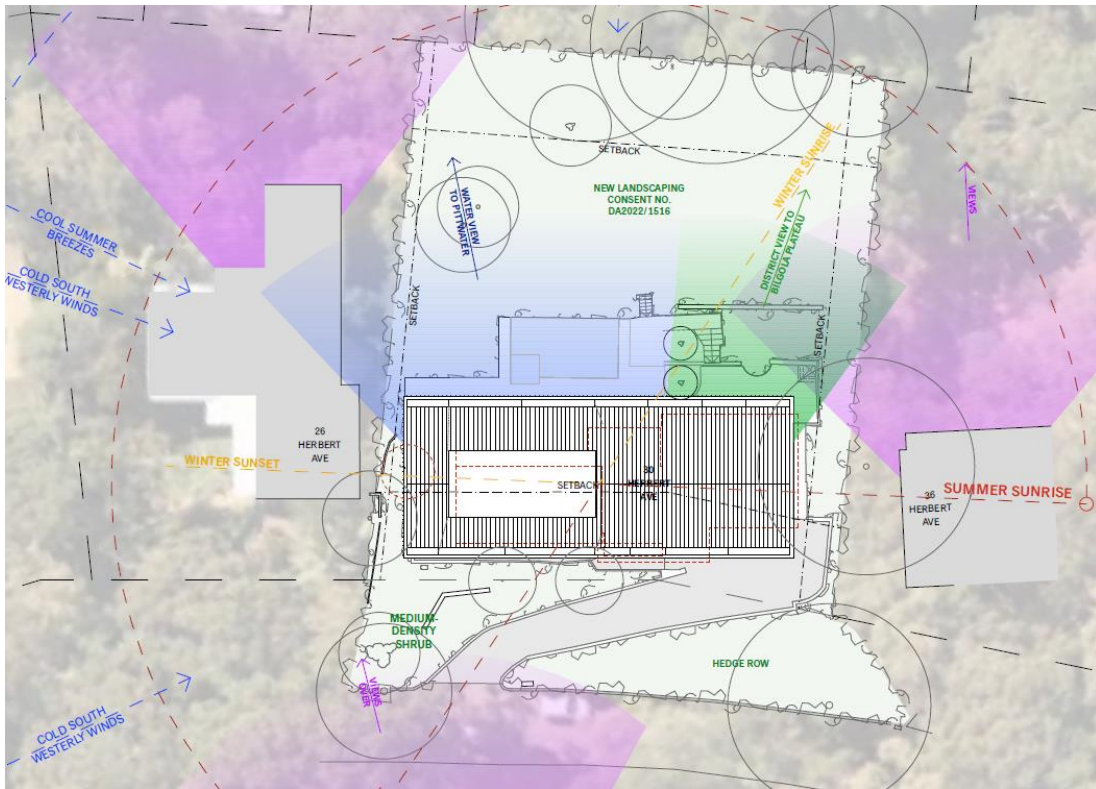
excerpt of the site analysis plan from the architectural plan set showing the footprint of the existing dwelling house, vehicular access, and respective locations of adjacent dwelling houses
